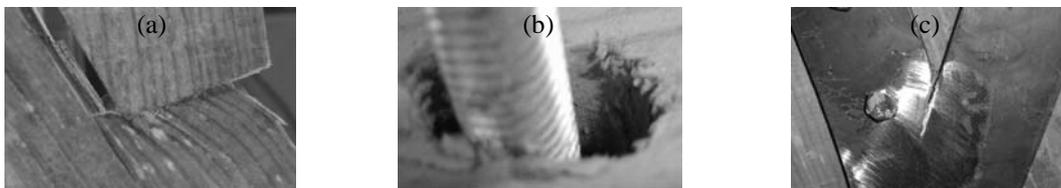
Failure modes and damages detected during the cyclic tests on the strengthened connections: (a) Compression in the joint with the binding strip, (b) Bending of the bolt with local embedment and (c) Stirrup failure.
